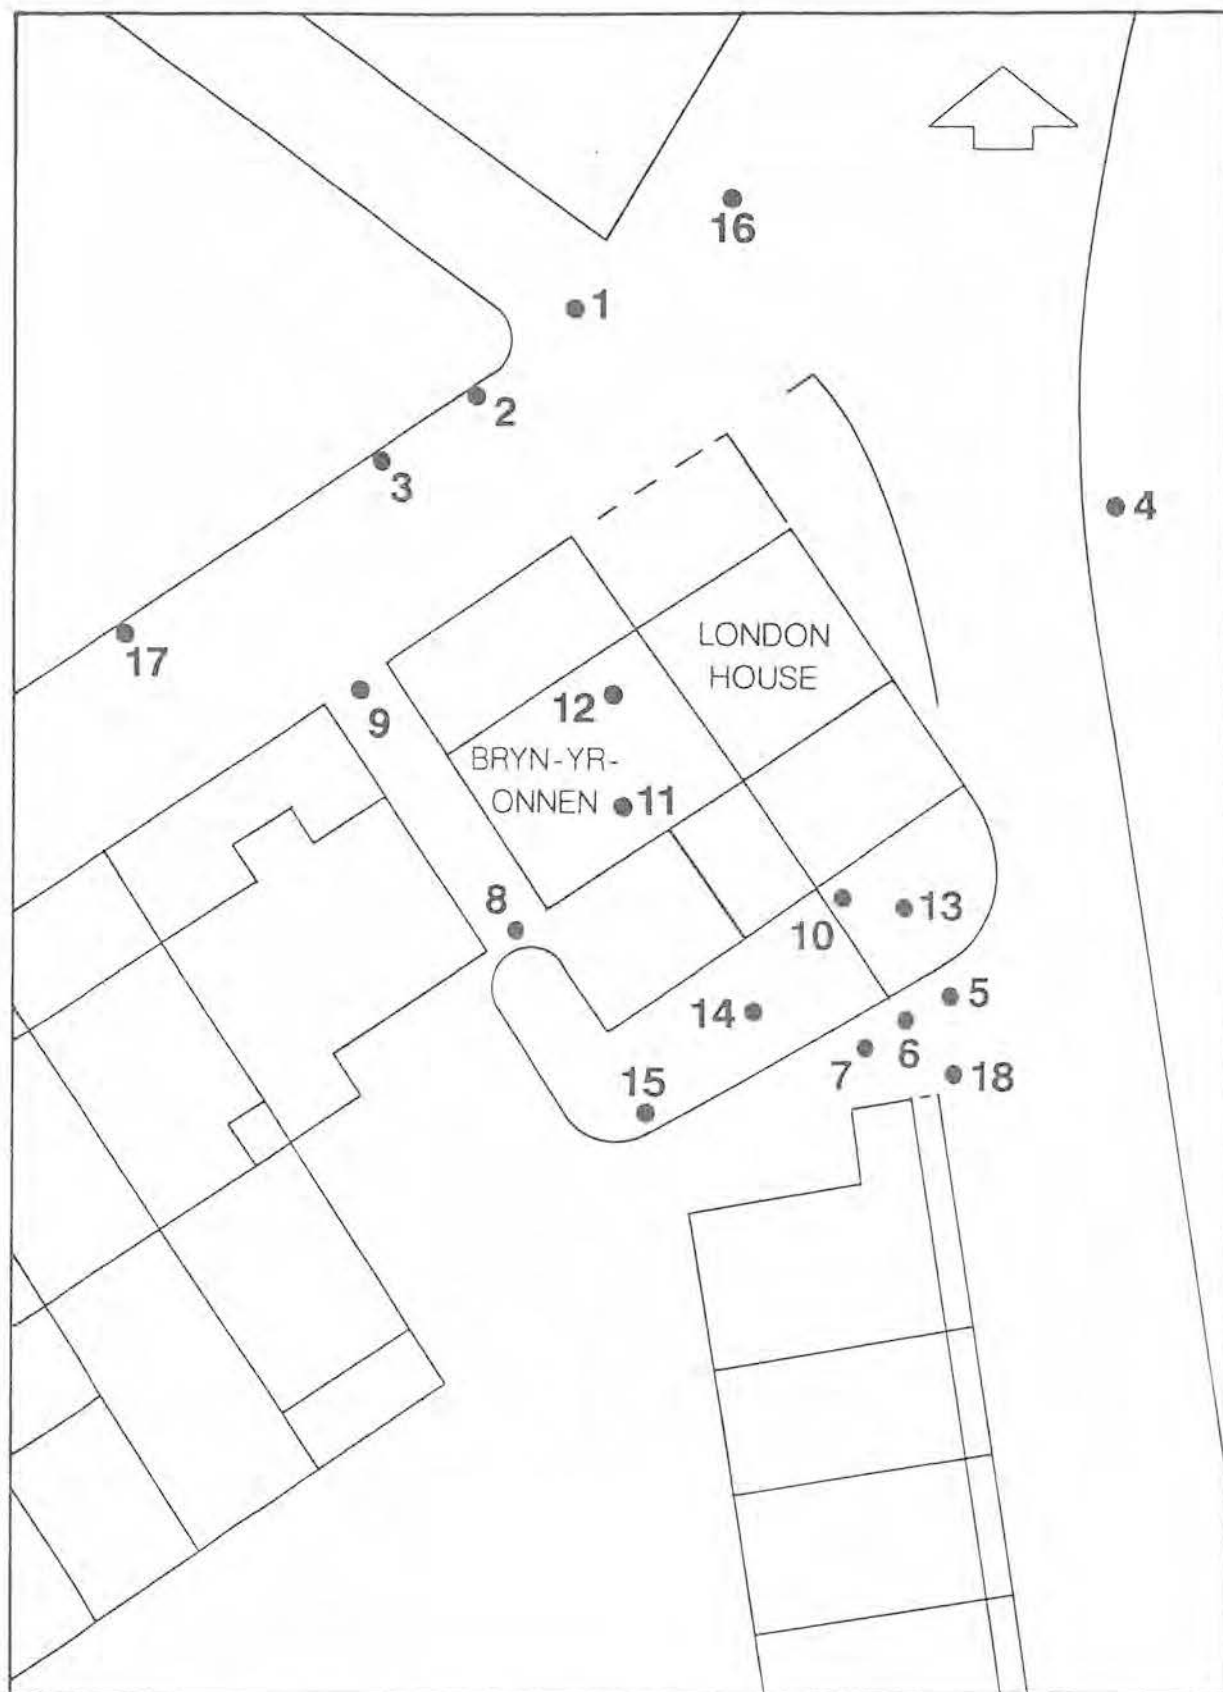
Location plan of photographic stations around Bryn-yr-onnen & London House.
